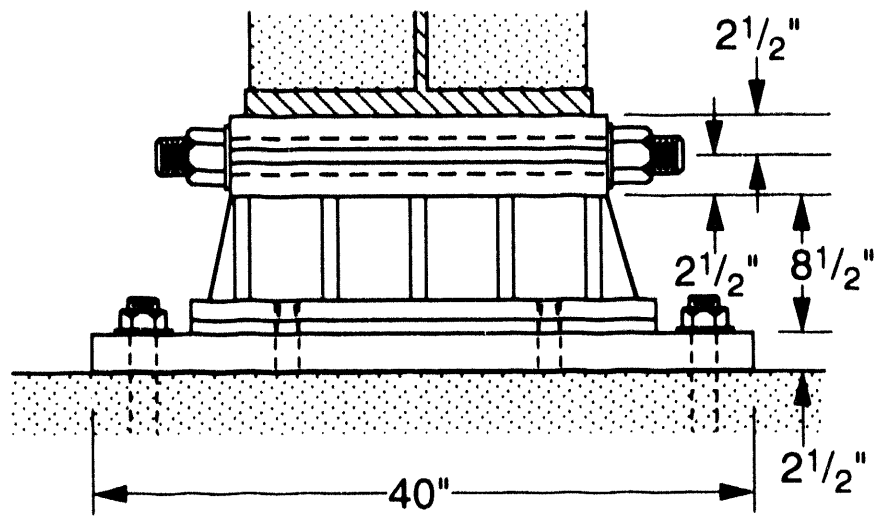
Connection detail found at pier 3 that allows longitudinal displacement.
